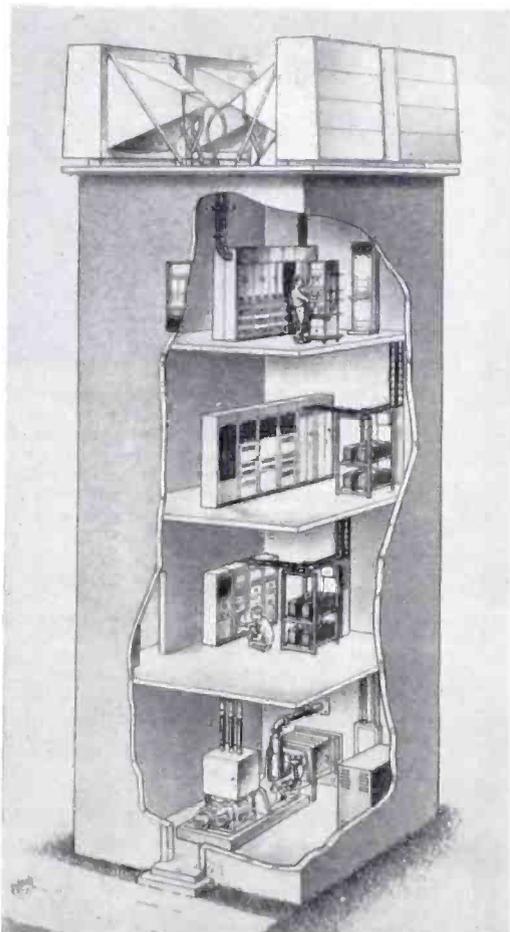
TYPICAL PLAN OF A CONCRETE TOWER
